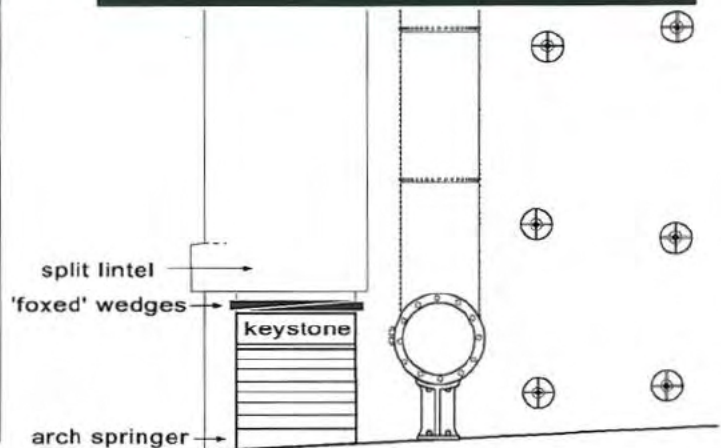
South facing section / elevation showing tailrace arch and location of wedges above keystone.
